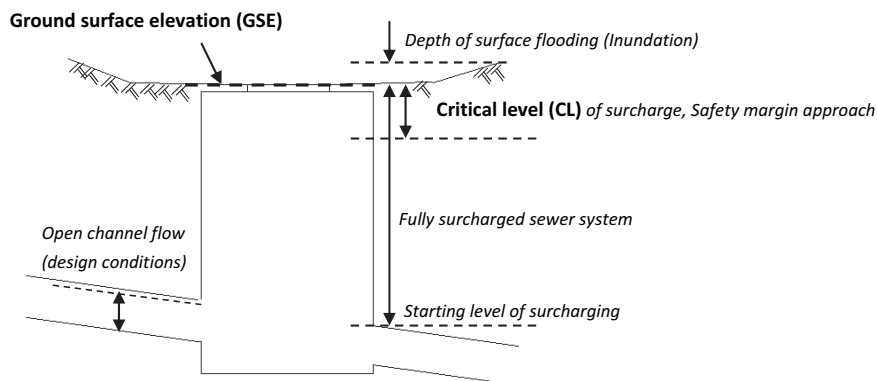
Notation sketch: Different threshold levels in relation to stormwater manhole (node) elevations, Ground surface elevation (GSE) and Critical level (CL).
